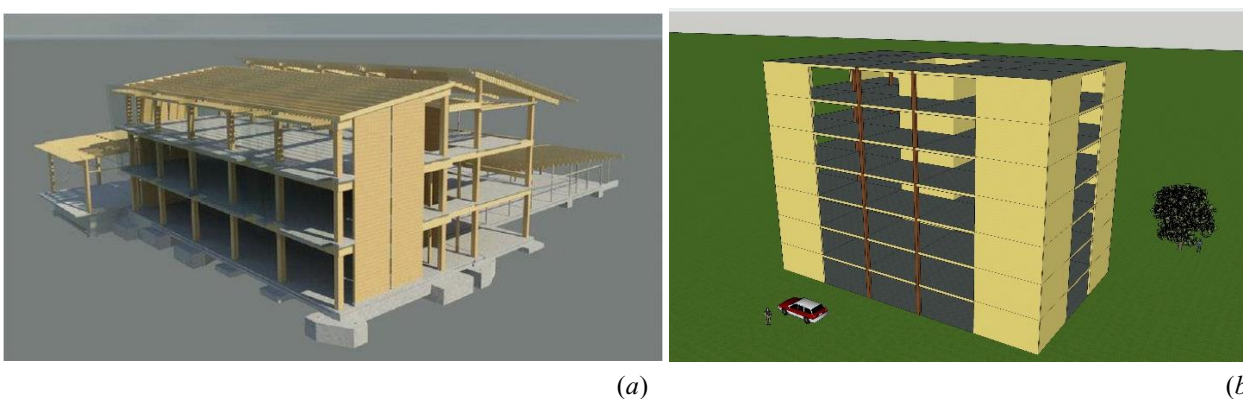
Mixed CLT walls-heavy frame system: (a) 3D view of the NMIT Arts and Media Building Structure and (b) example of a 7-storey multi-storey mixed CLT walls-heavy frame system (image credits: (a) Devereux *et al.* [57]).
